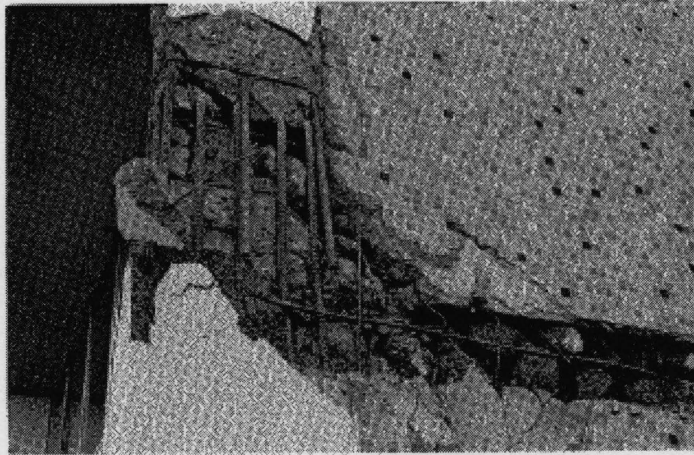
3 Failure of a structural wall construction joint during the 1971 San Fernando EQ. (Jennings 1971).
